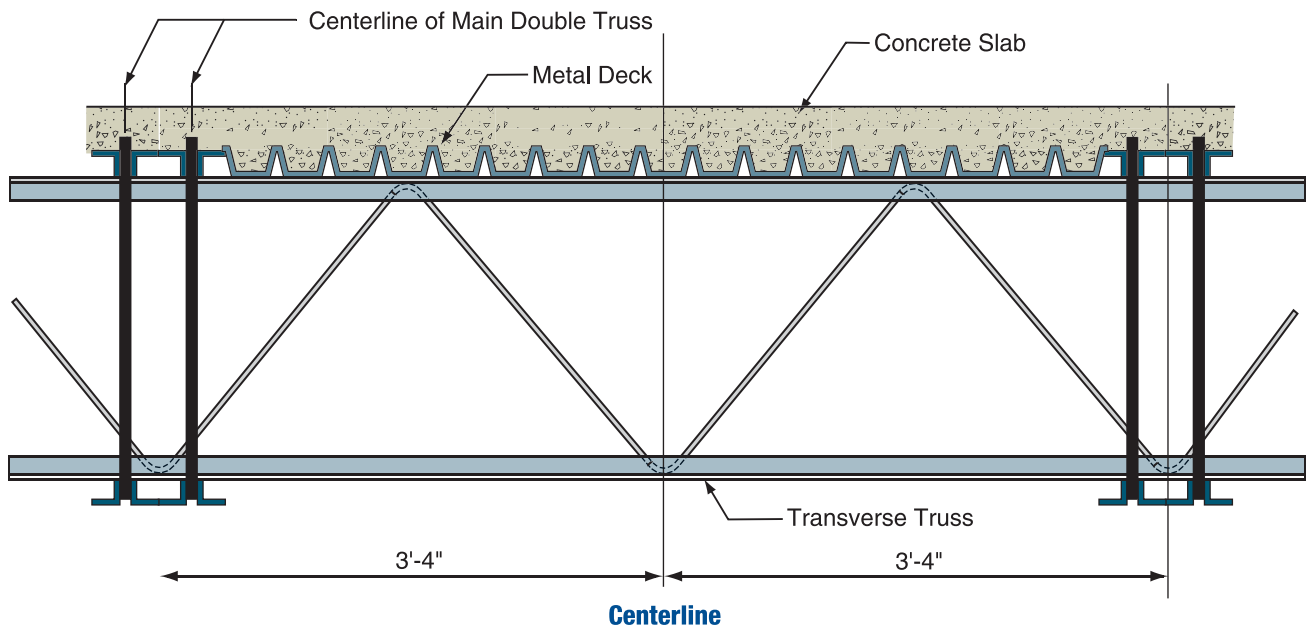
Cross-section through main double trusses, showing transverse truss.
